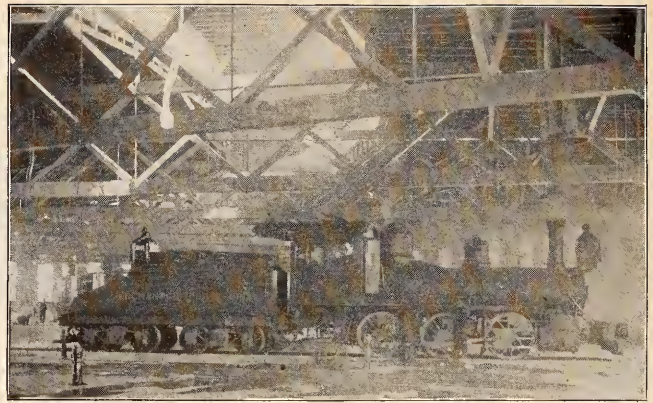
VIEW INSIDE OF ROUNDHOUSE, SHOWING ROOF TRUSSES AND MONITOR IN ROOF—TERMINAL R. R. OF ST. L.
